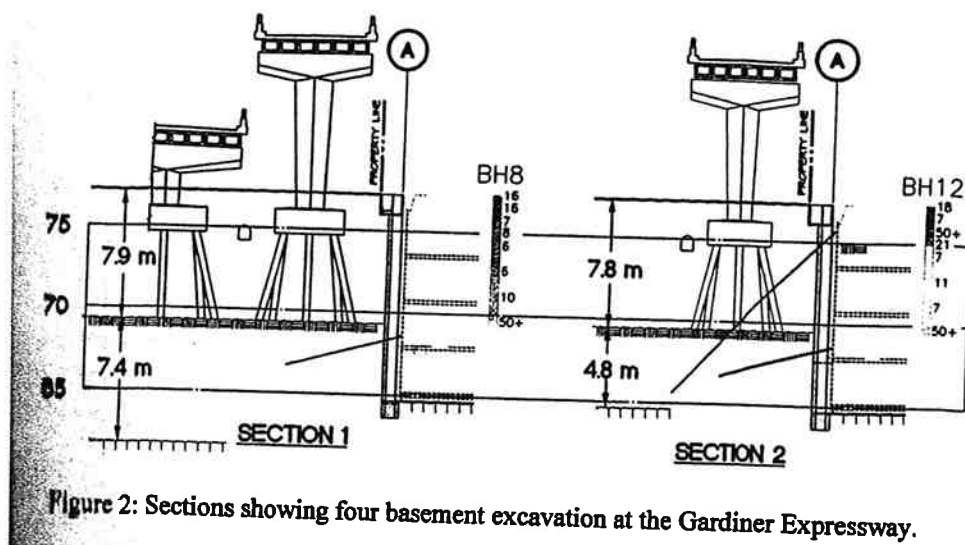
Sections showing four basement excavation at the Gardiner Expressway.
